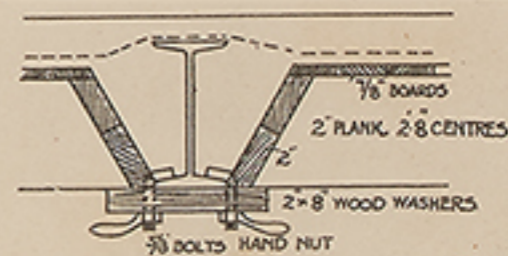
Centering for Concrete Floor having Steel Main Beams.
